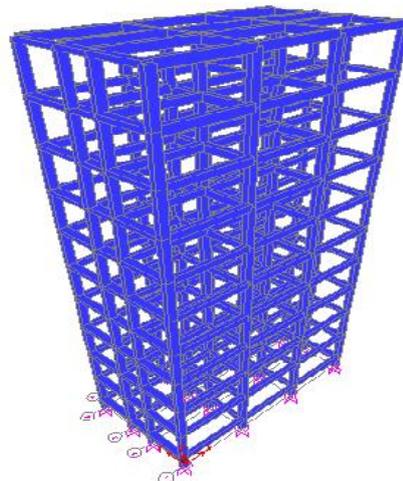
3D view of fixed base building (G+9) in SAP 2000
